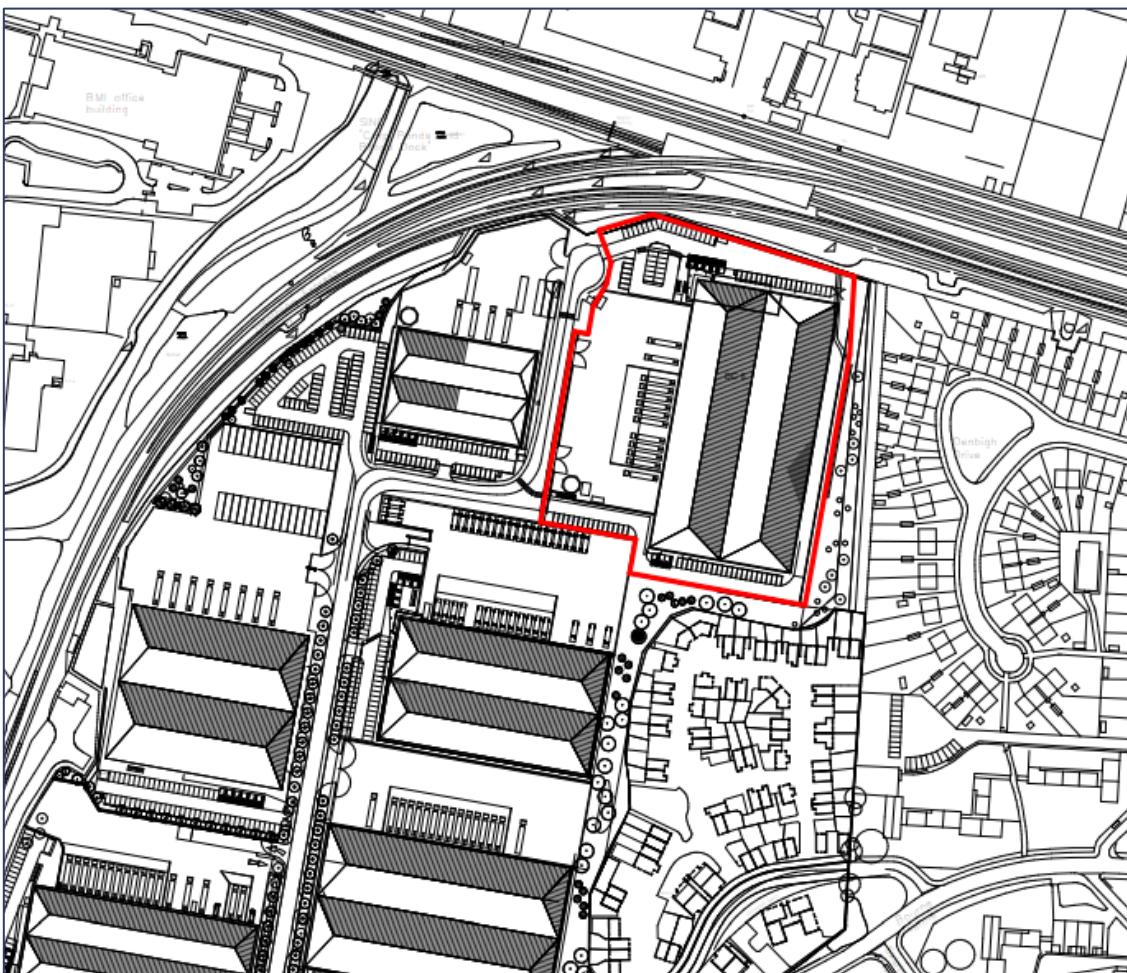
Site Location Plan (Source: Stephen George + Partners)
